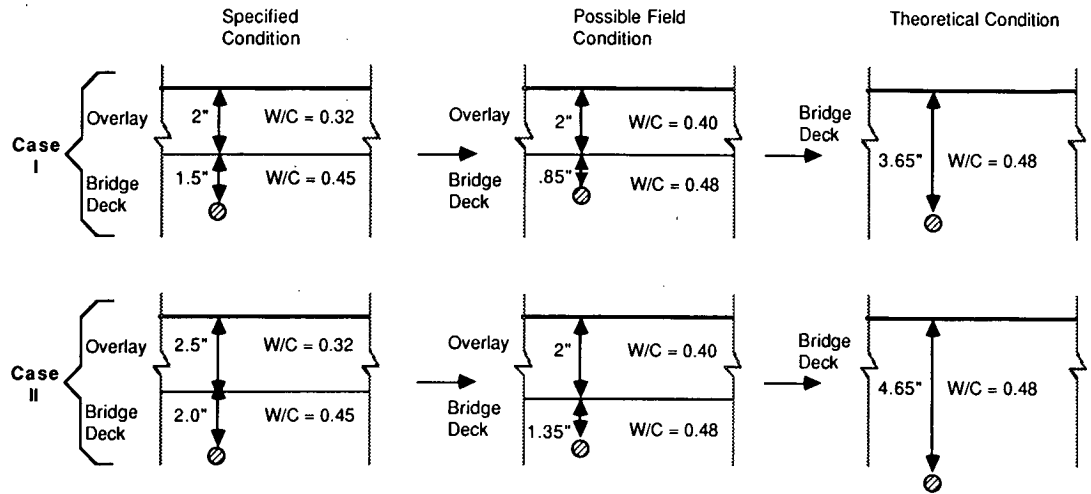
Concrete water/cement ratio and thickness in bridge decks overlaid with low-slump dense concrete.
